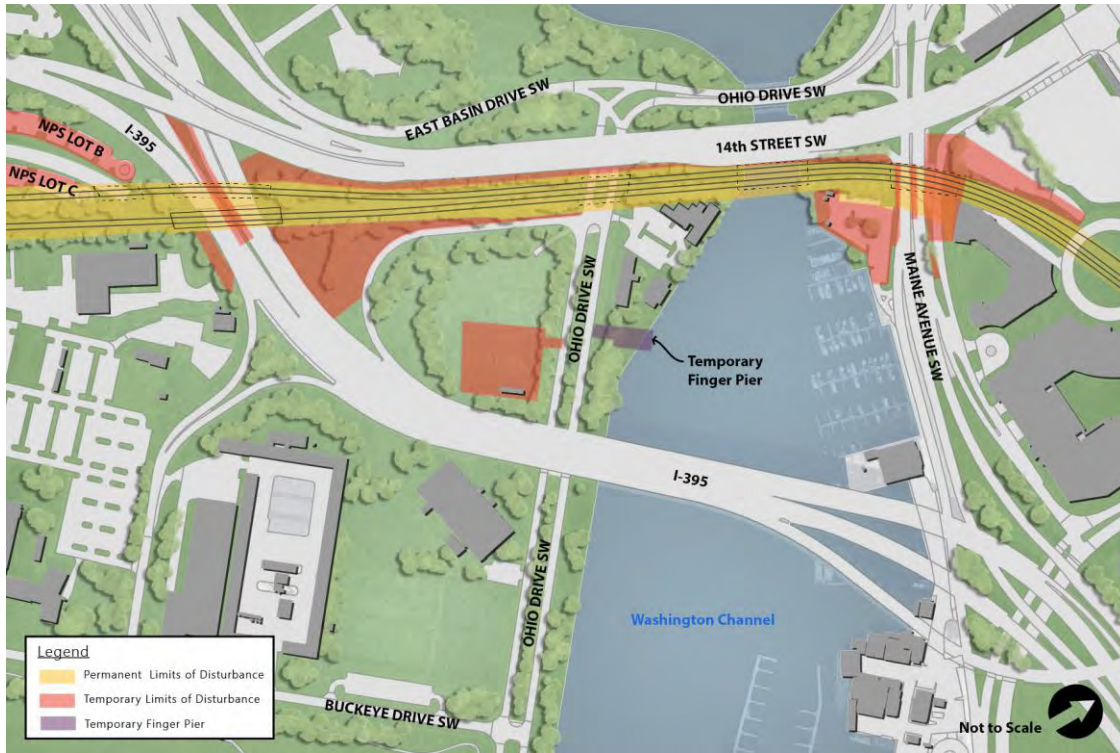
| Construction Access and Staging Locations – Potomac River
